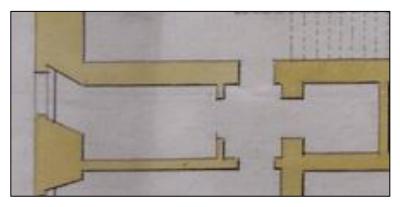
Extract from the 1780s plan of the building, first floor of Cell F
